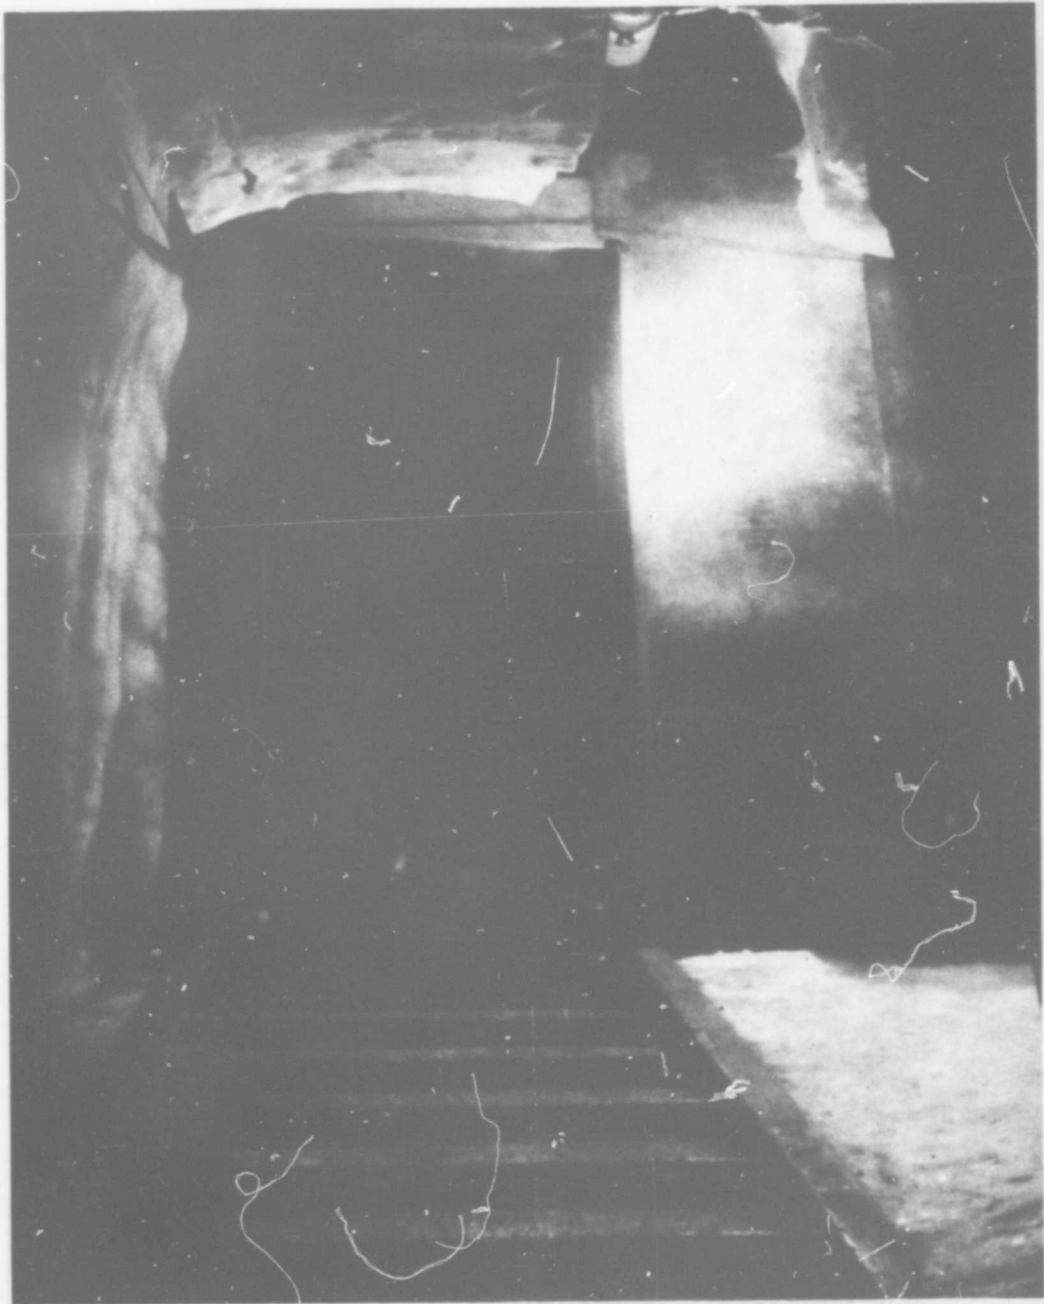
Passageway from tunnel M-1 to L-5 showing door and bulkhead opening around overhead water line.
